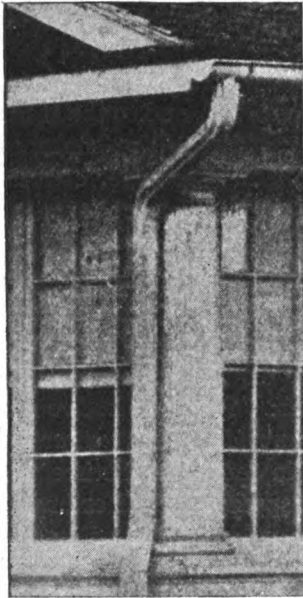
A Typical Corrugated Iron Leader Connection to Gutter
